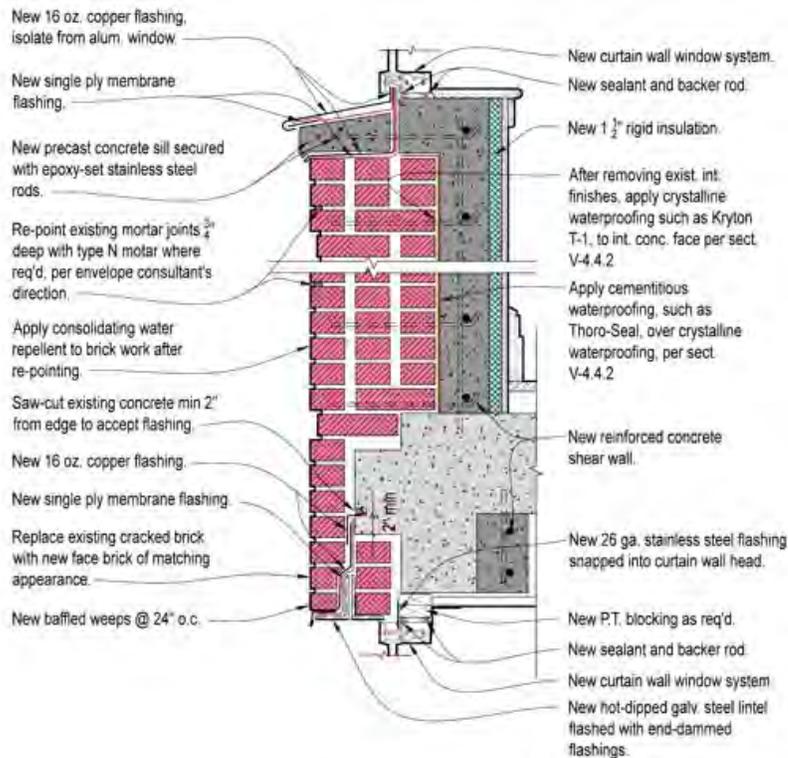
(4): Option 1 Restoration Approach at Typical Stone-Sill Windows
